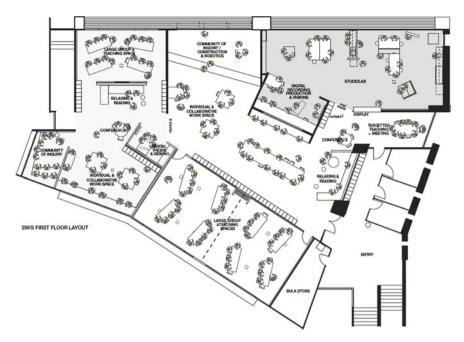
Suburban High School, School Within School (SWiS) building first floor plan (image: Hayball & Mary Featherston Design)
